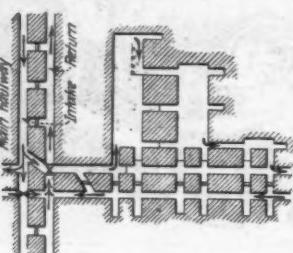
GENERAL PLAN, SHOWING DOUBLE 50-FT. ROOMS
